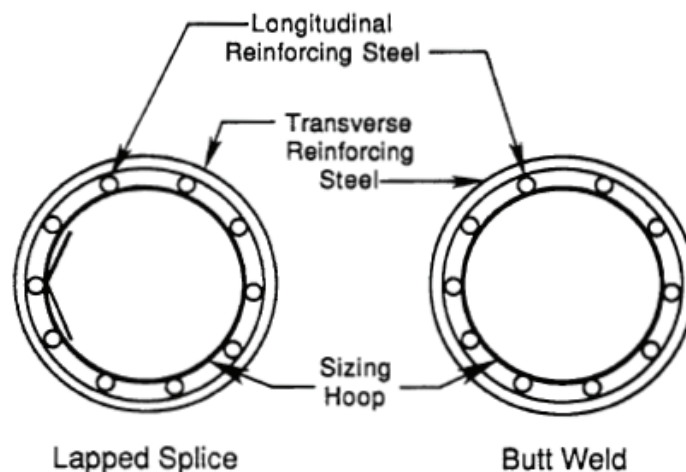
Sizing Hoop Assembly (from Le Laboratoire Central des Ponts et Chaussées, 1986)
